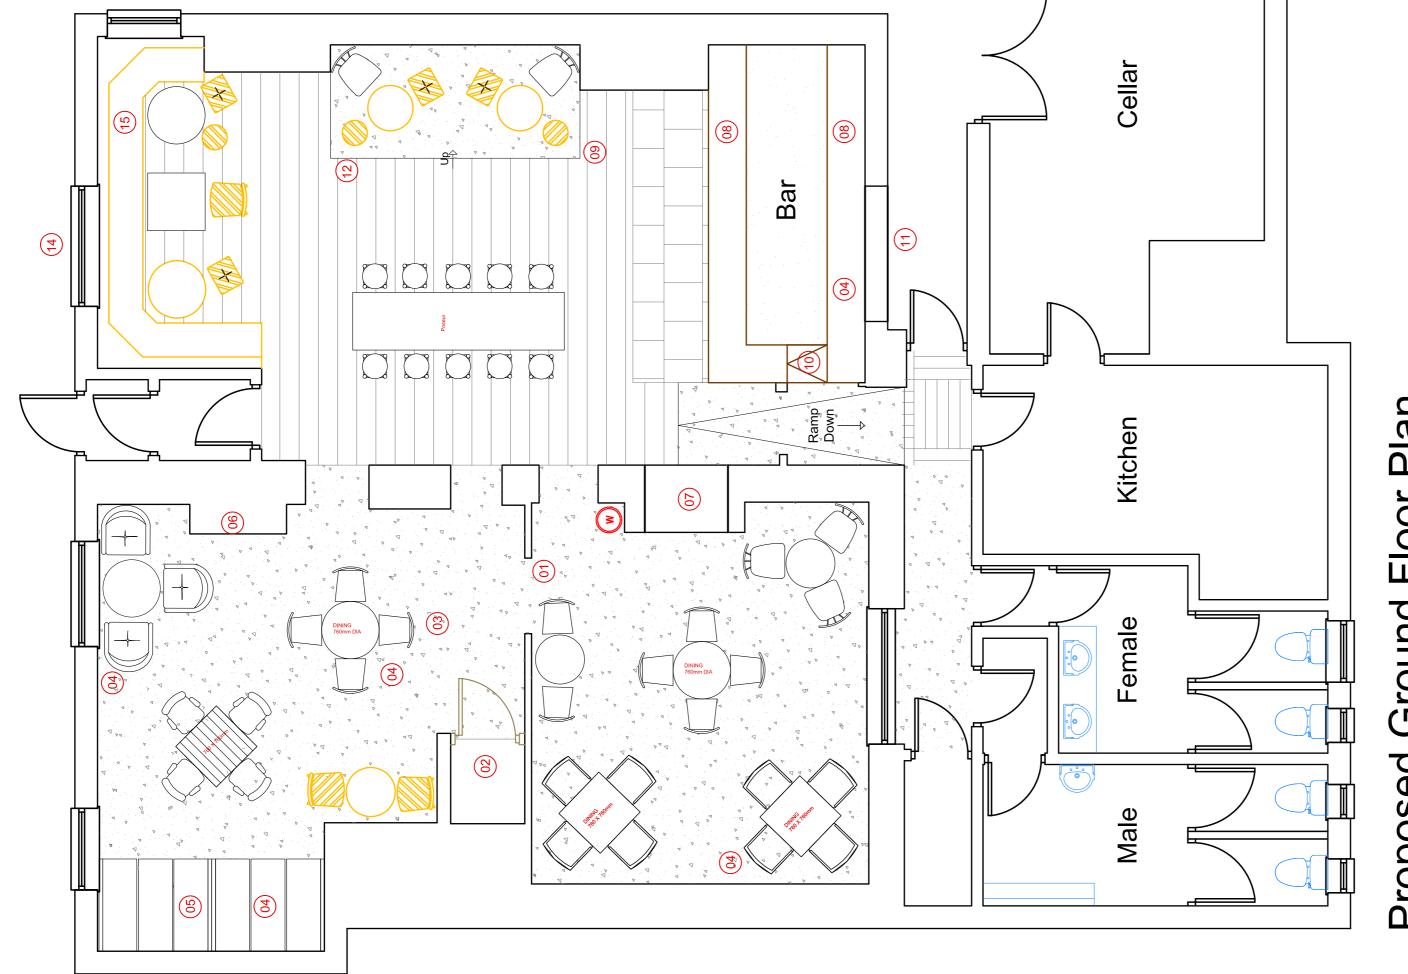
2.02, Rev B - Proposed Ground Floor Plan Option 2, dated 24.02.15 (received and scanned to LPA system 30th June 2015).
